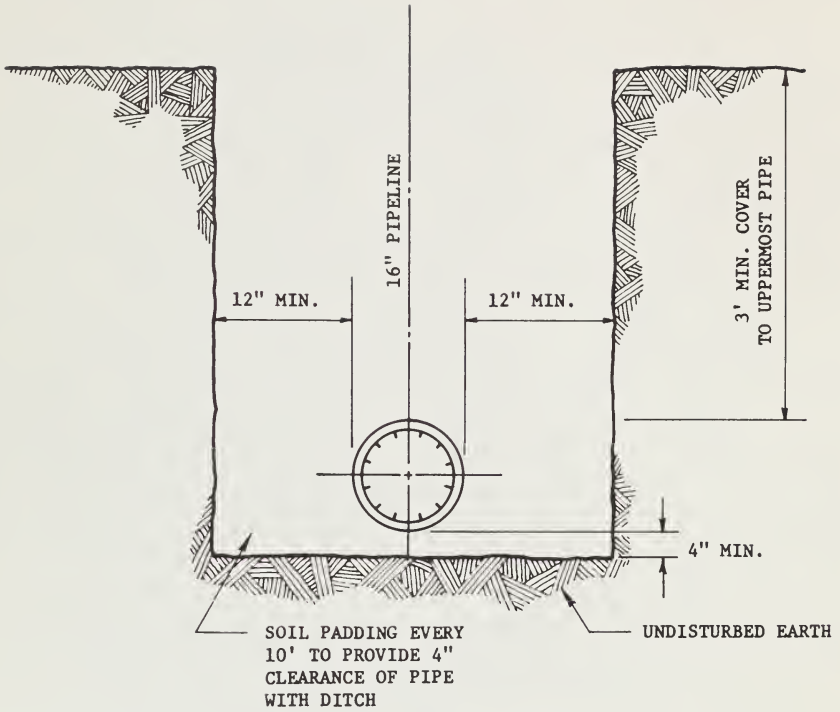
TYPICAL PIPELINE DITCH DESIGN
